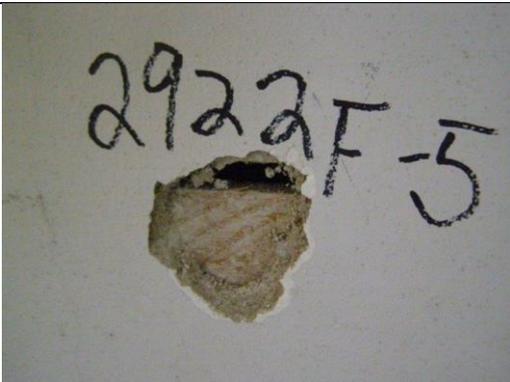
Plaster (2922F-5) Family Room, Wall D.
